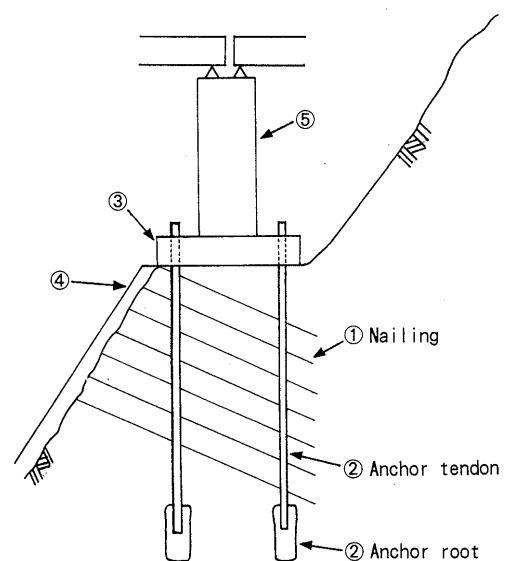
One of possible applications for a slope supporting a tall heavy structure
